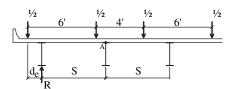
Loading diagram for exterior girder with two lanes loaded and two wheels to beam.
